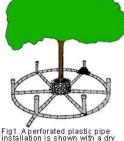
A perforated plastic pipe installation is shown with a dry well and vertical bell pipe to provide aeration for tree roots beneath deep soild fill.
